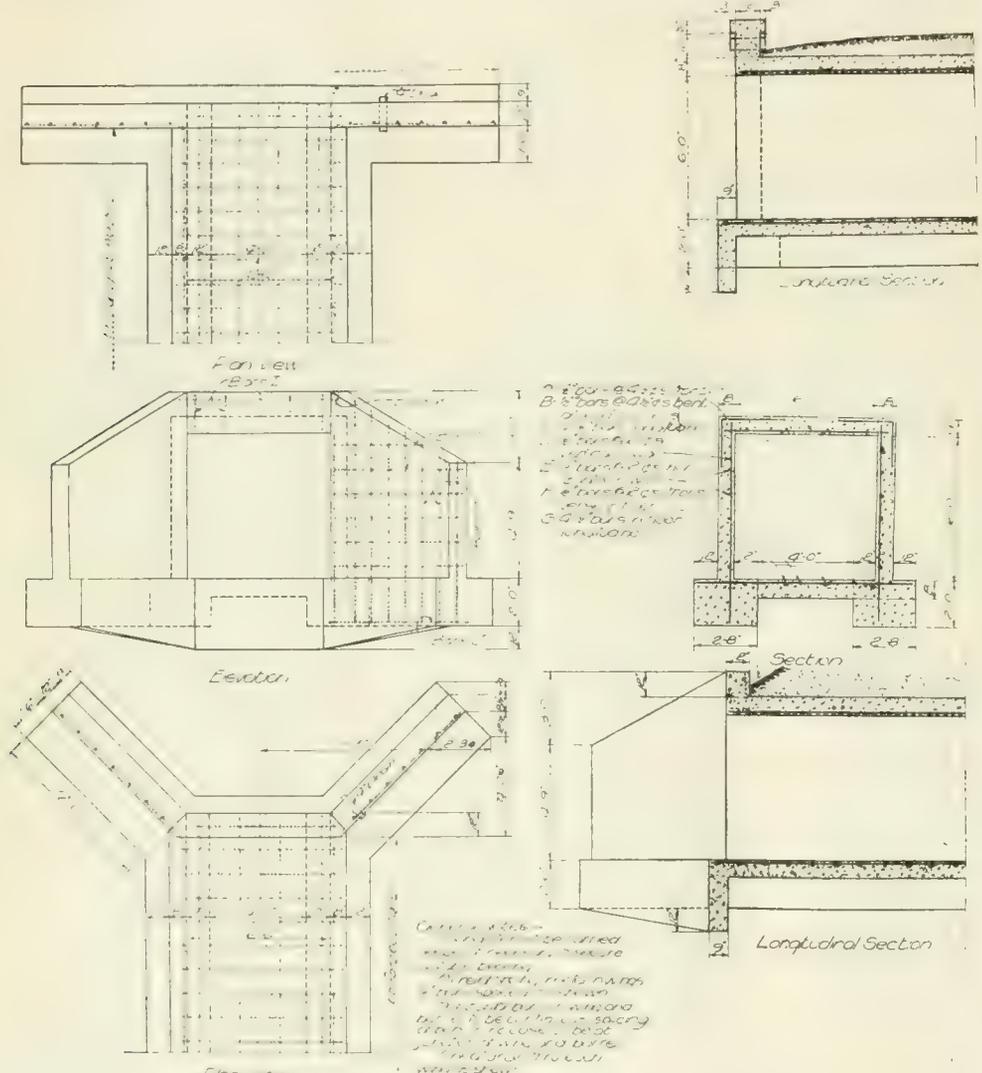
Standard Design for a 6-ft. by 6-ft. Box Culvert with Straight and Flared Wings.
